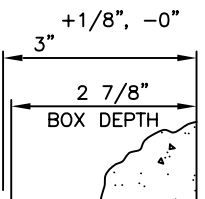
SUGGESTED BOX PREP DIMENSIONS
